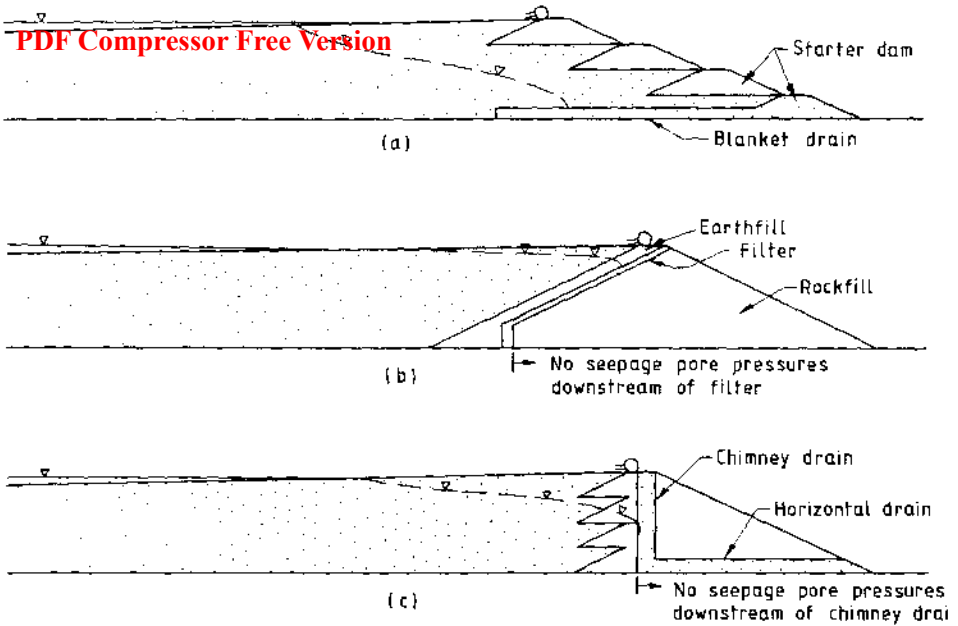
Use of internal drainage zones in embankments a) upstream embankment using starter dam with upstream blanket drain; b) downstream embankment; c) centreline embankment with vertical chimney drain
